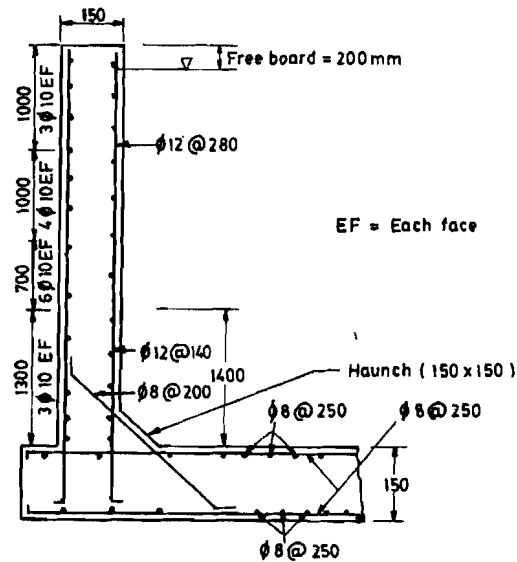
Vertical Section of Tank Showing Reinforcement
